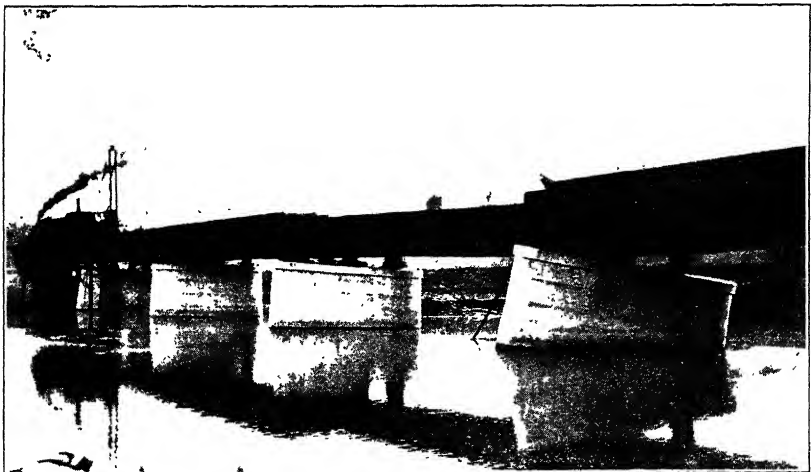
Bridge Piers of Big Four Railroad near Miamisburg, Ohio. Undermined and Part of Bridge Destroyed by Flood of 1913 (see page 28).
